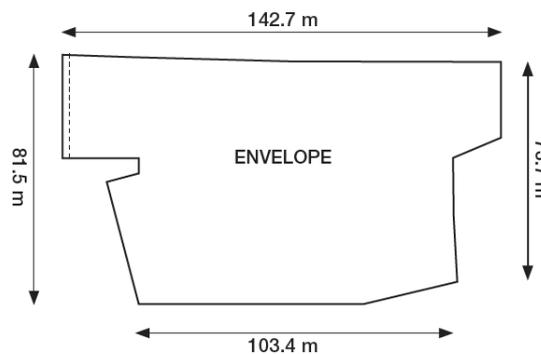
Block B site boundary dimensions (Source: Woods Bagot & SOM architects)
